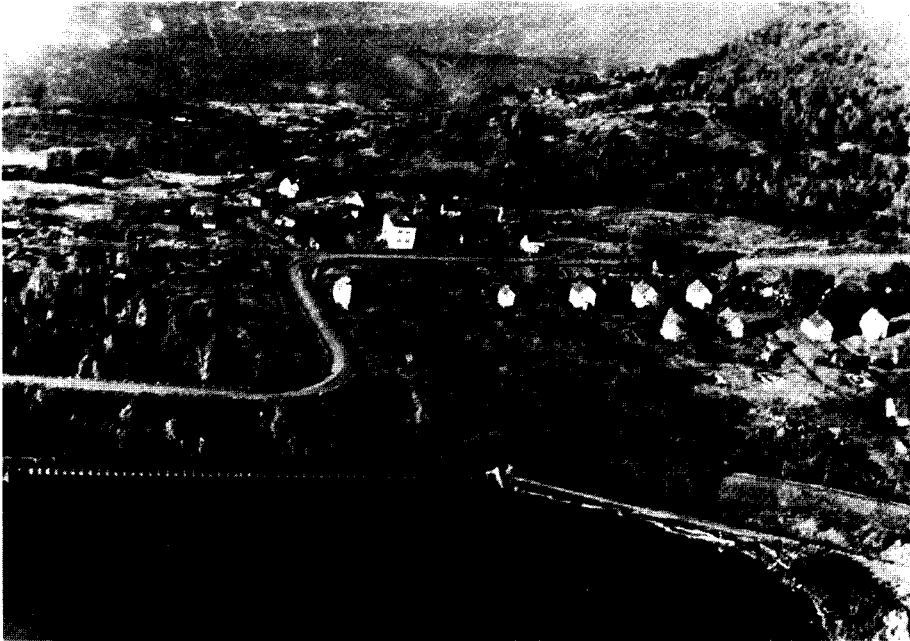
Aerial view of the Redridge steel dam around 1947. The small former milling town of Redridge is in the background. Photo by Bill Brinkman, from Bill Brinkman Collection, Copper Country Archives, Michigan Technology University, Houghton, Michigan.
